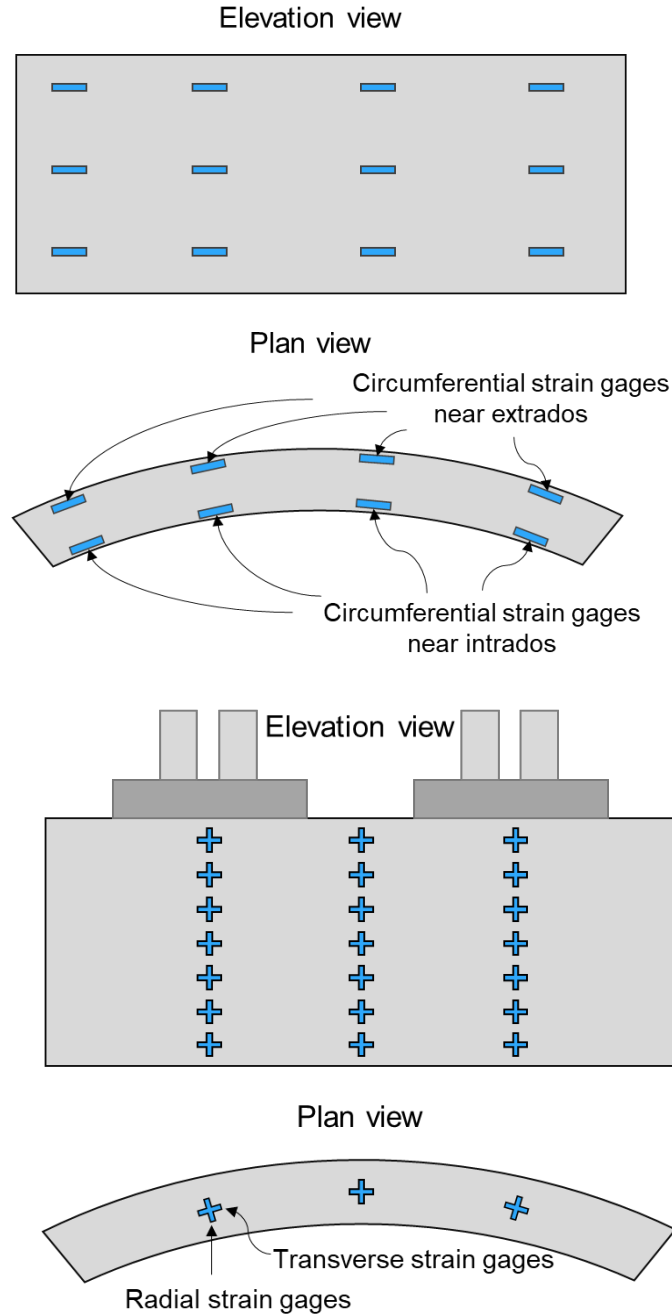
Plan and profile views of example embedded strain gage positions to measure: (a) hoop (axial) force, bending moment and related circumferential stresses; (b) thrust jack pad load bursting stresses in the radial and transverse (circumferential) directions.
